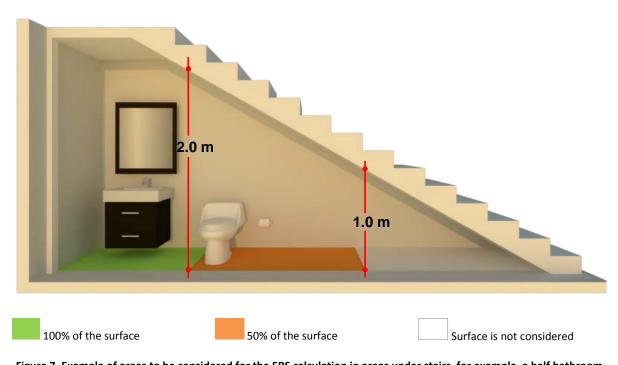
Example of areas to be considered for the ERS calculation in areas under stairs, for example, a half bathroom (Source: Infonavit/Albarrán)
